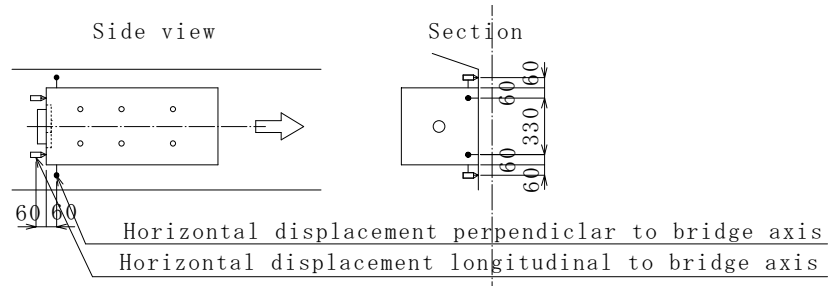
Position of displacement of concrete anchorage block (Unit: mm)
